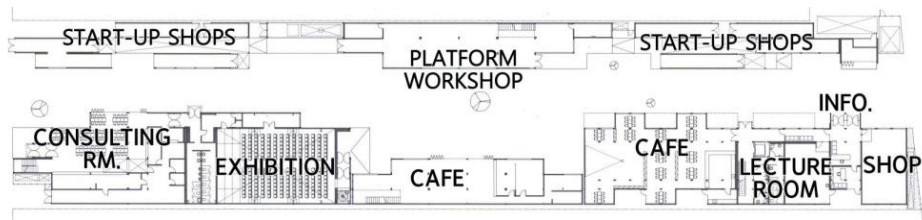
Understand avenue- 1st floor plan: A&C, vol.429, pp.102, 2017.02
